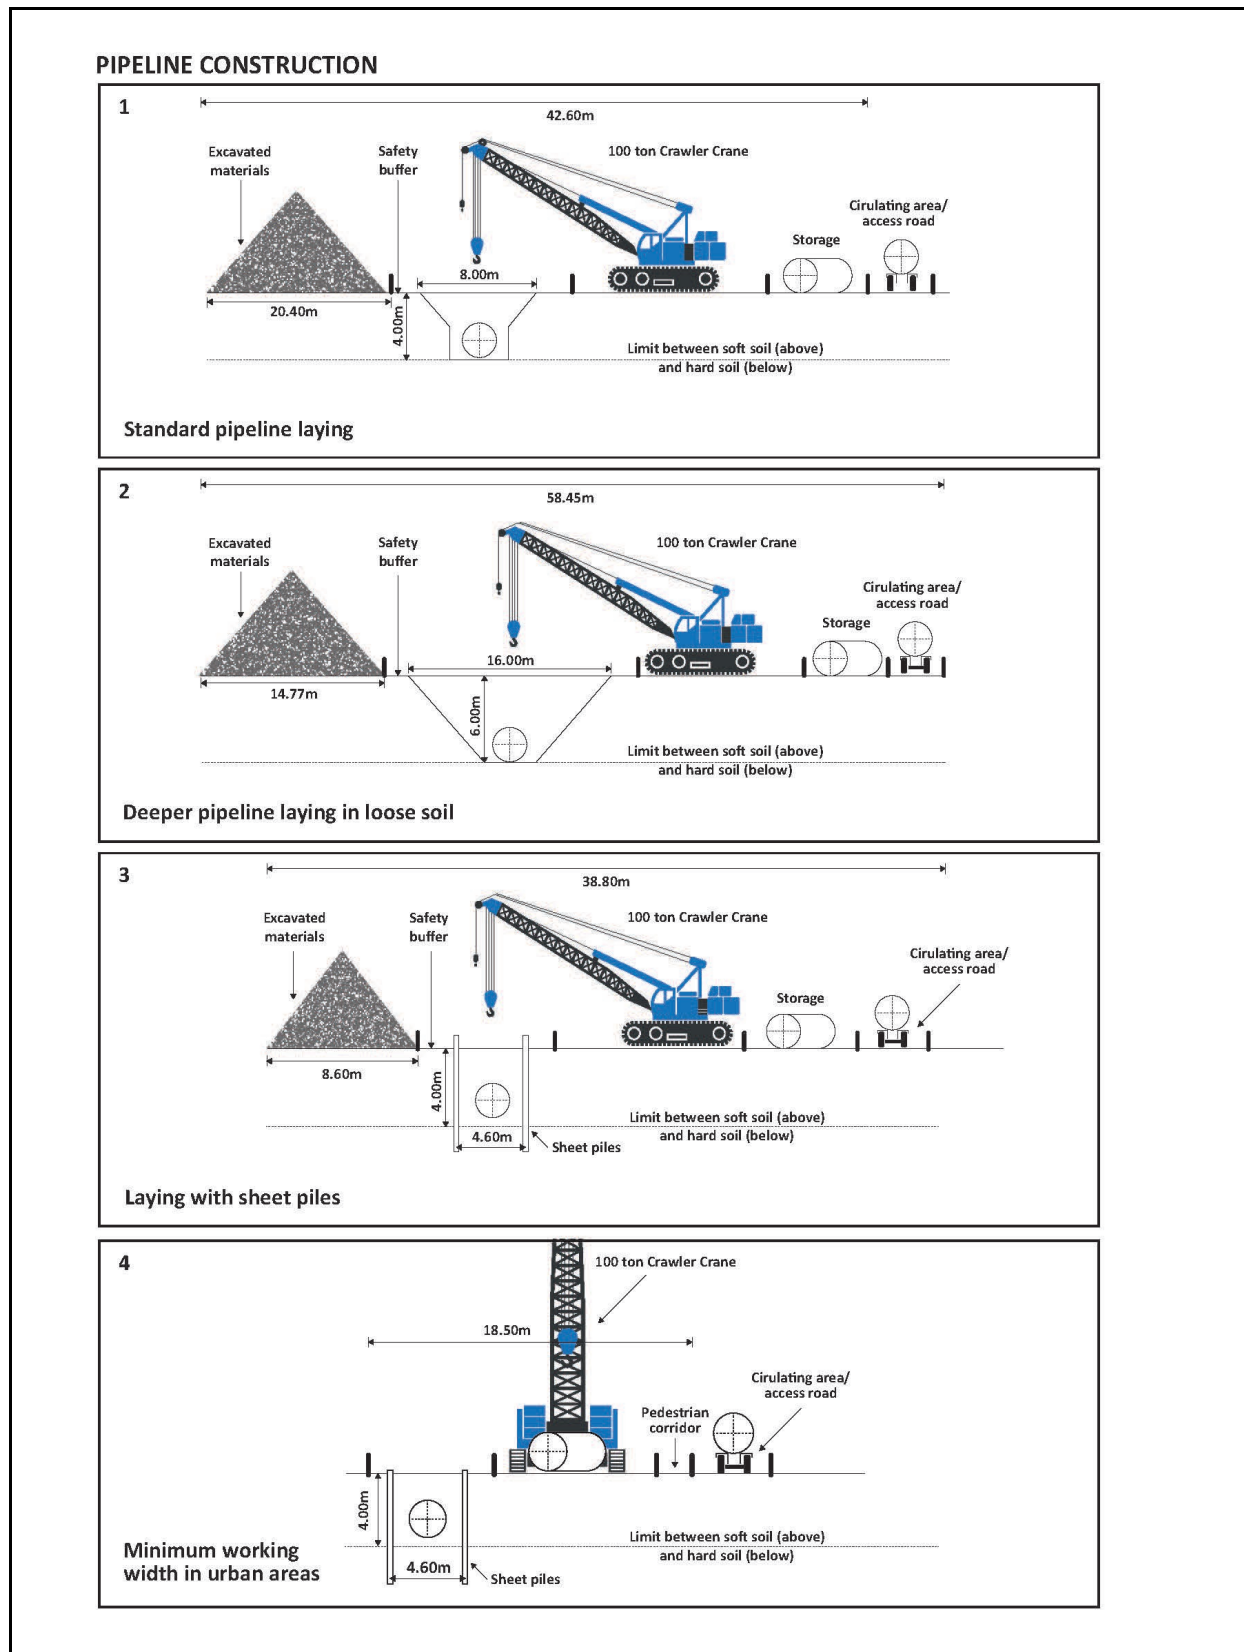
below presents the typical configuration for standard pipelaying, pipelaying with space constraints using sheet piling, pipelay in loose soils and the minimum working width within urban areas.
